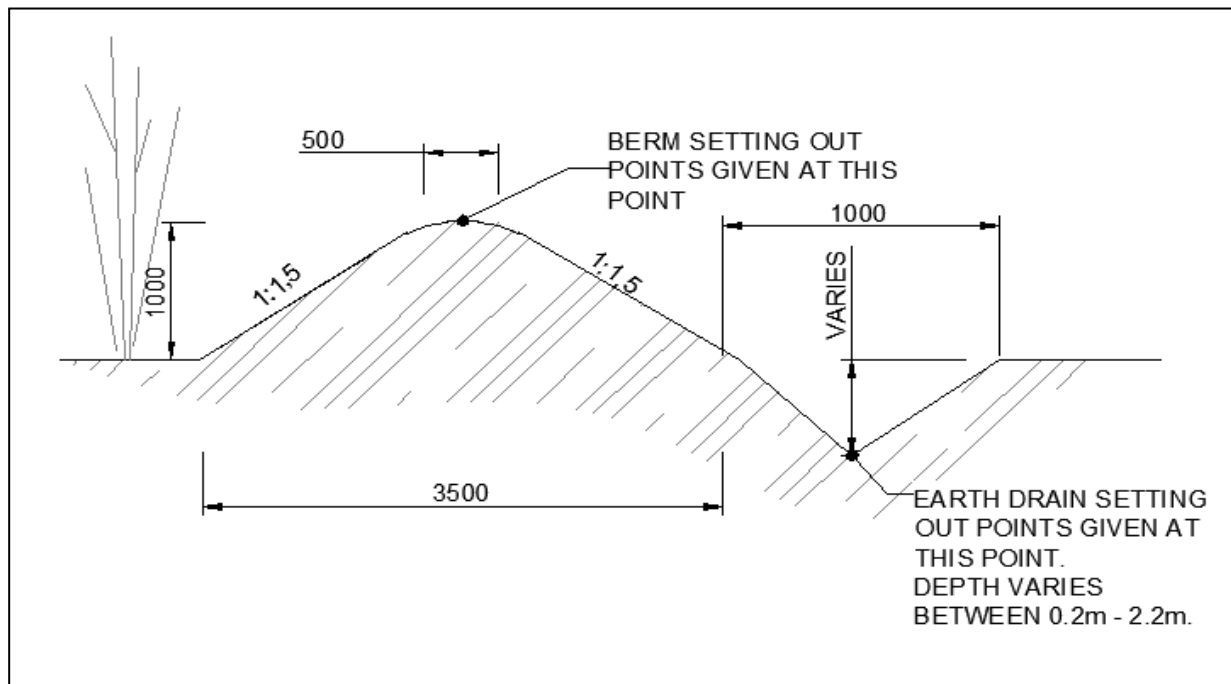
TYPICAL DESIGN OF A EARTH BERM
